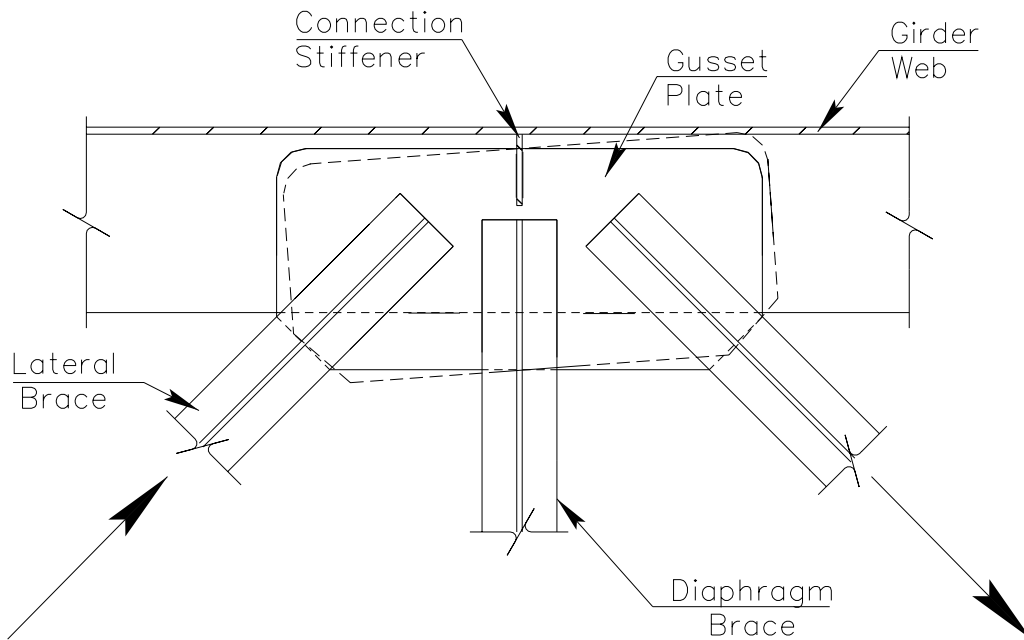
Gusset Plate Cracking (Full Spans)
